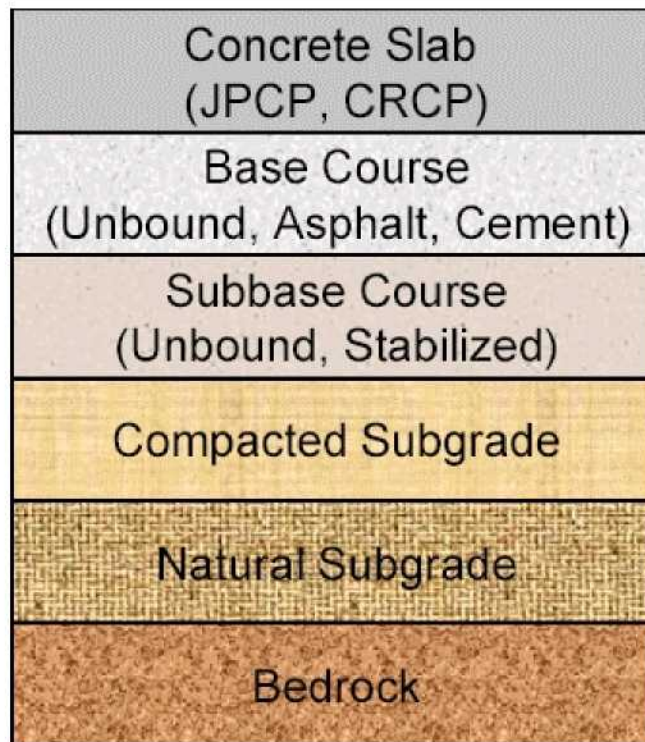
Variations for rigid pavement section (NCHRP 1-37A, 2002).
